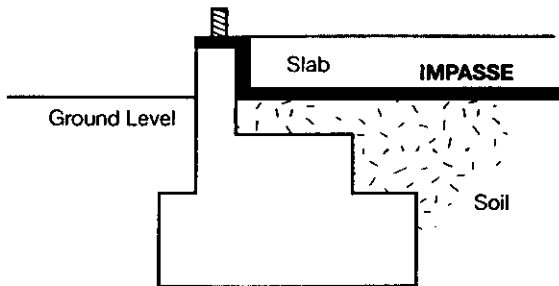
Shows position of Impasse Barrier installed around an external beam. Impasse Barrier is laid after the footings have been poured. Note the extension of the Impasse Barrier at the interface of the footing and slab panel.
